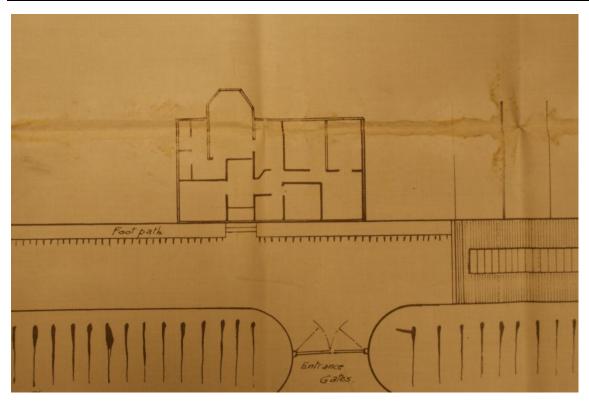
Layout of building 6 shown on plans of 1935 (CR2487/Box 36/690)
